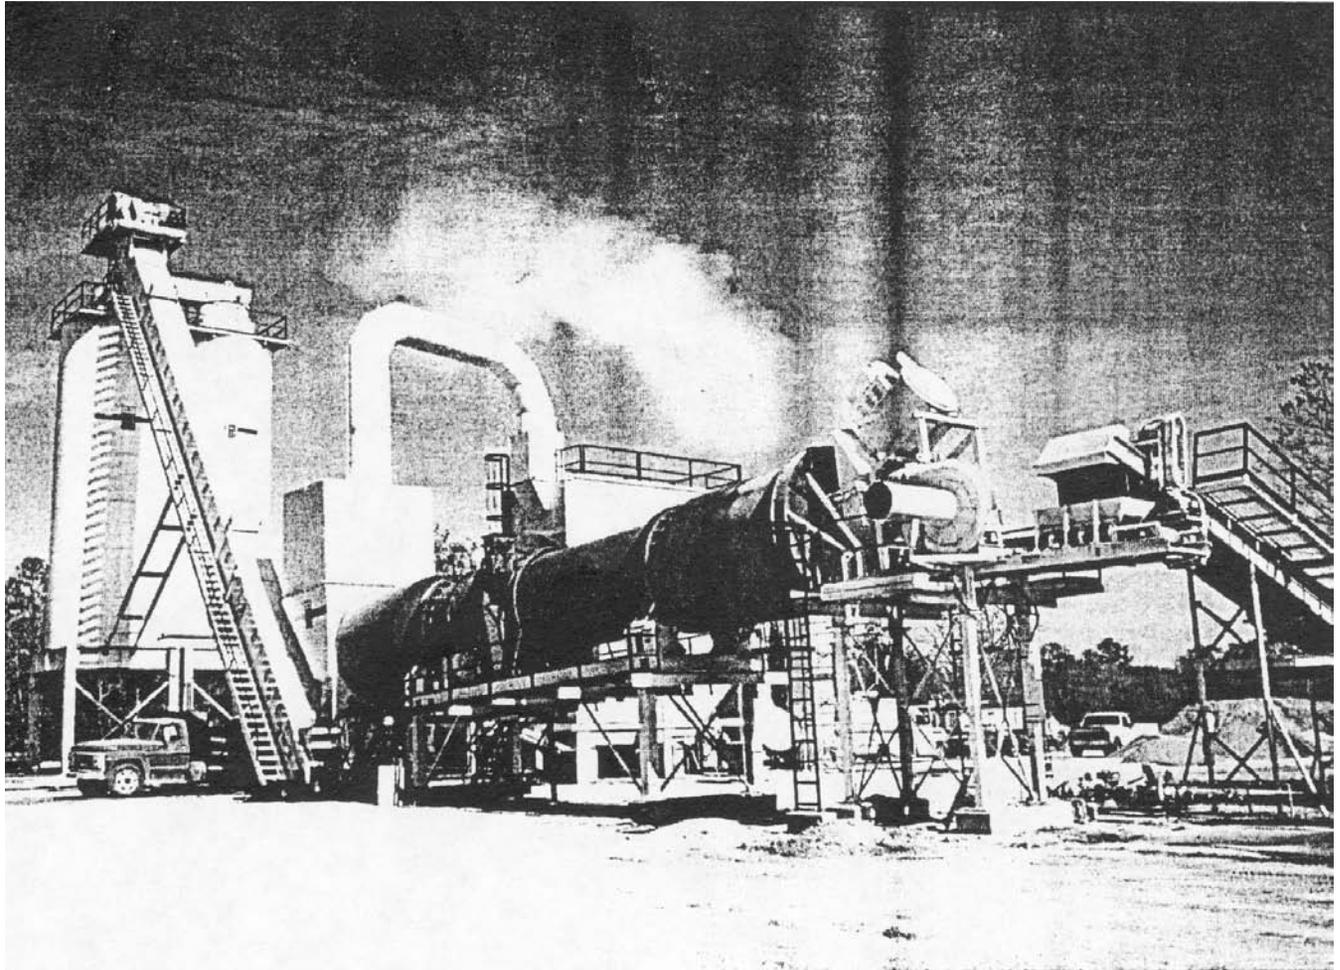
Typical HMA parallel-flow drum-mix plant.
